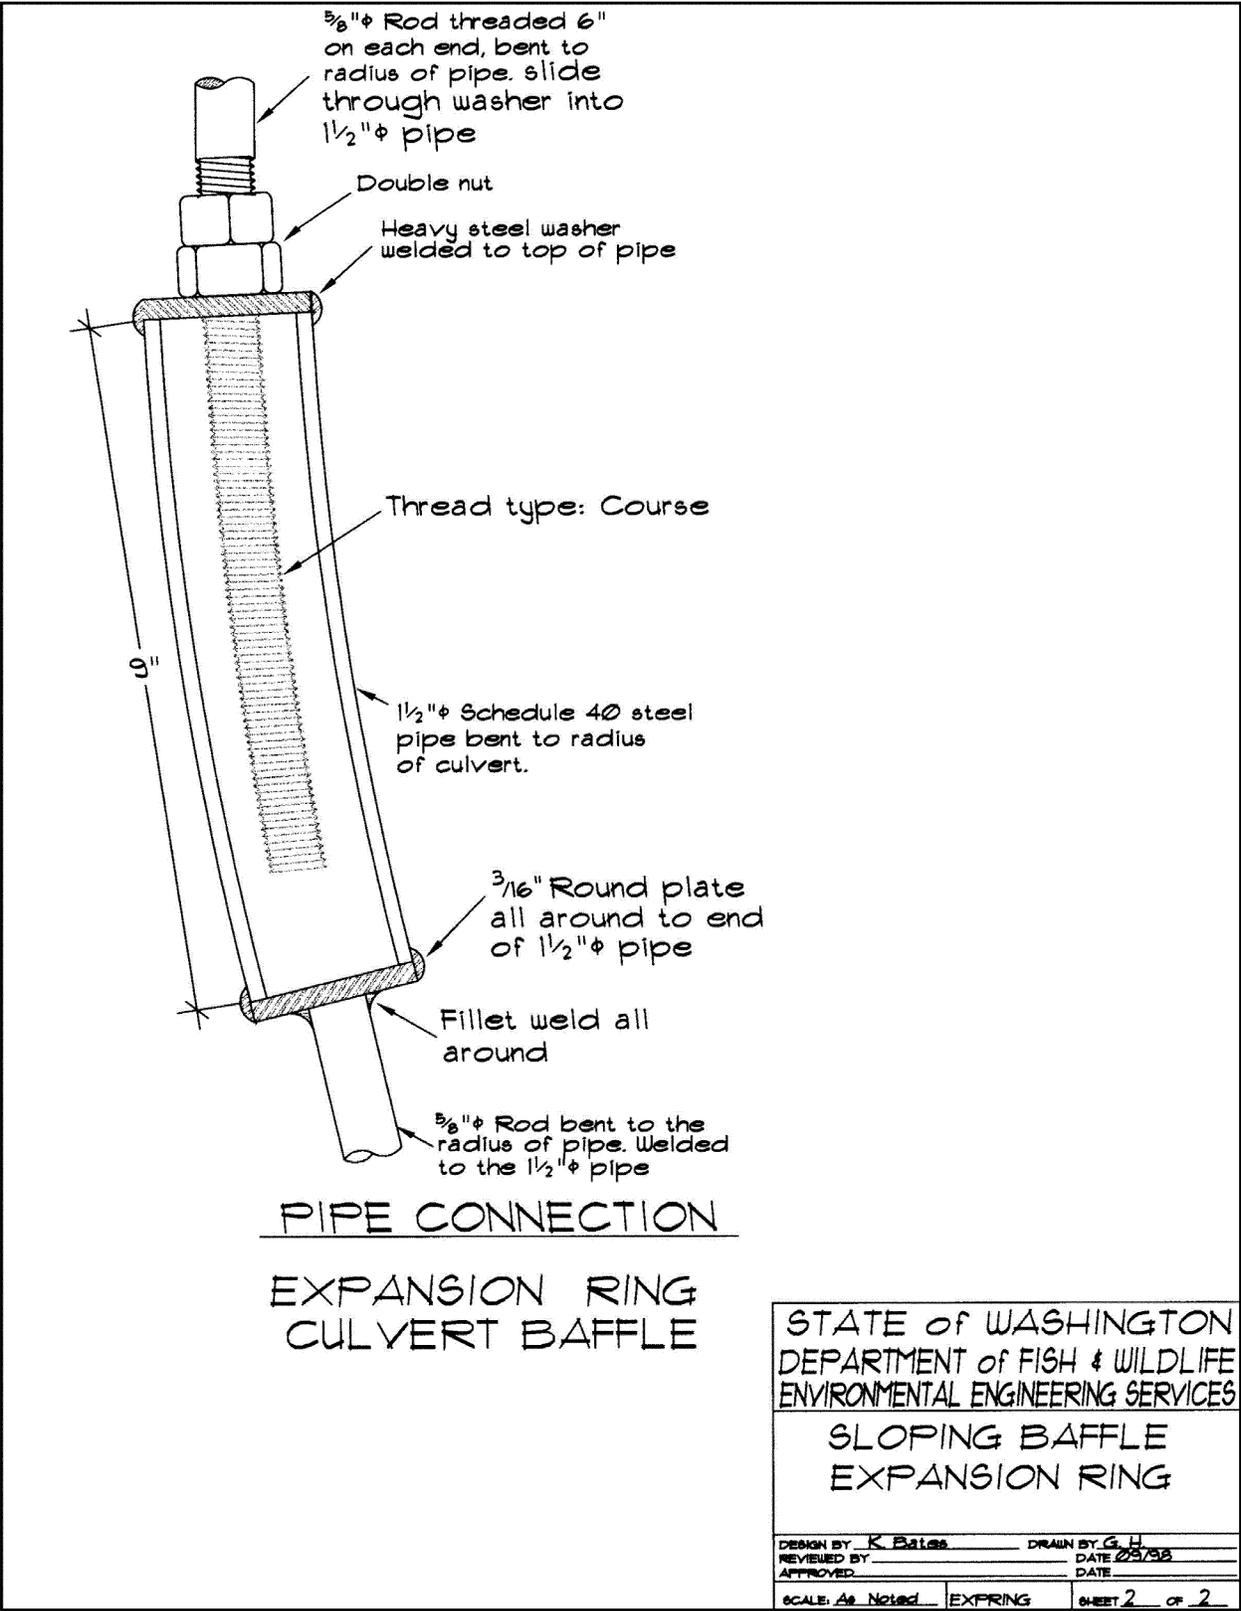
Pipe Connection - Culvert / Sloping Baffle: Expansion Ring
